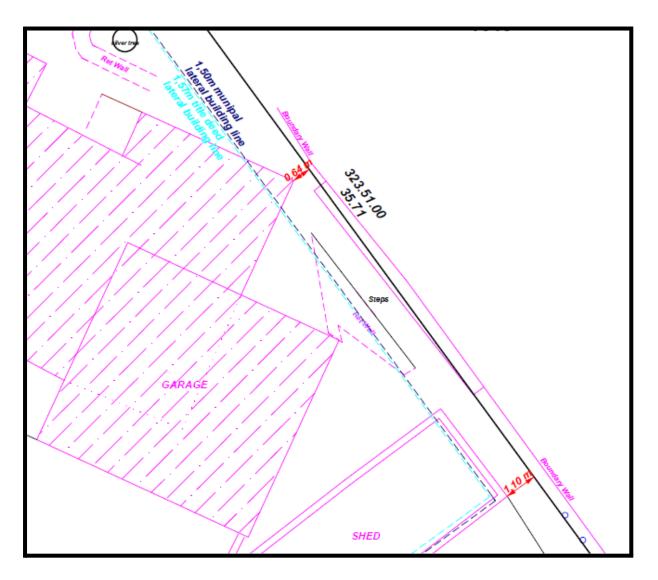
EASTERN LATERAL BUILDING LINE ENCROACHMENT
